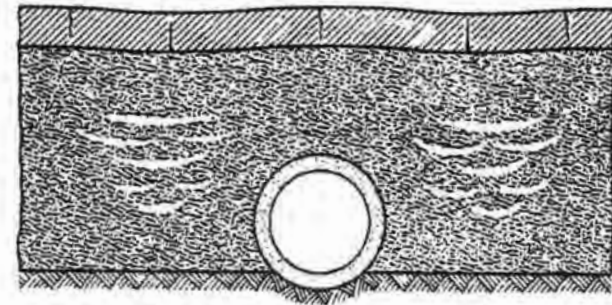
Pavement Failure Due to Inadequate Compaction or Low-Quality Fill Soil Adjacent to Rigid Pipe
